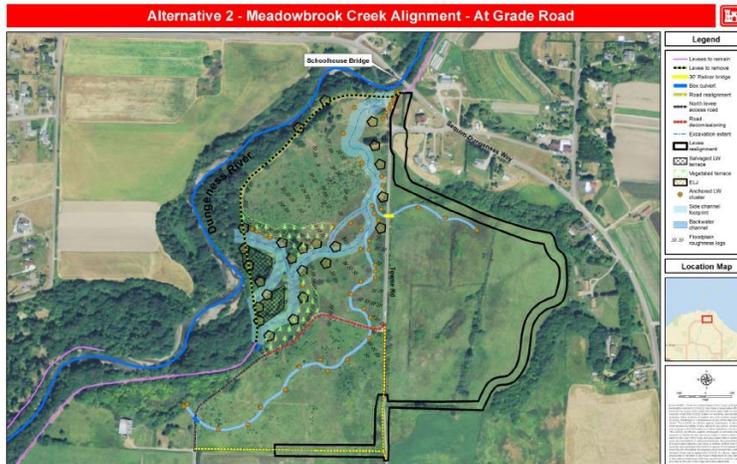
Alternative 2: Meadowbrook Creek Alignment - At-Grade Road
